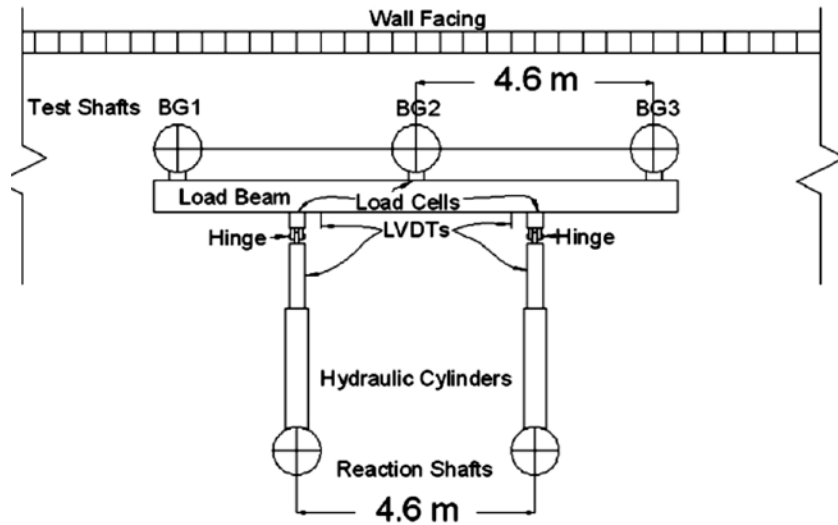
Schematic of pile group loading (Pierson et al. 2010)
